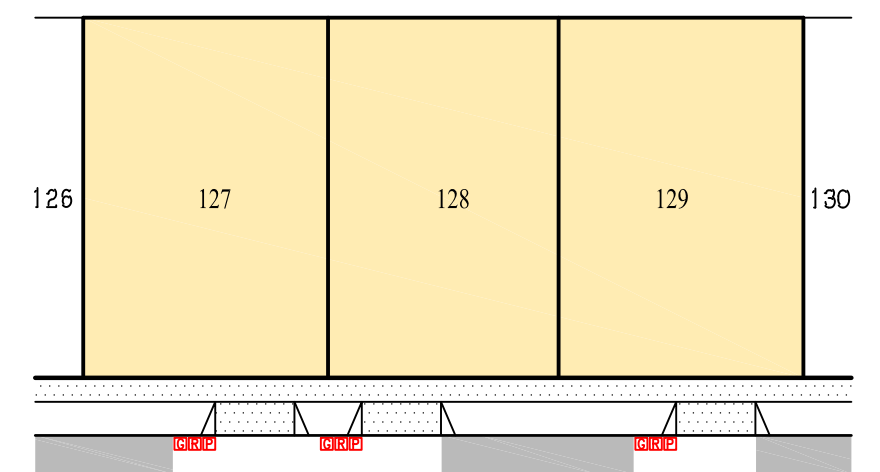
DETAIL A - LOW DENSITY 48'-60' x 90' LOTS
